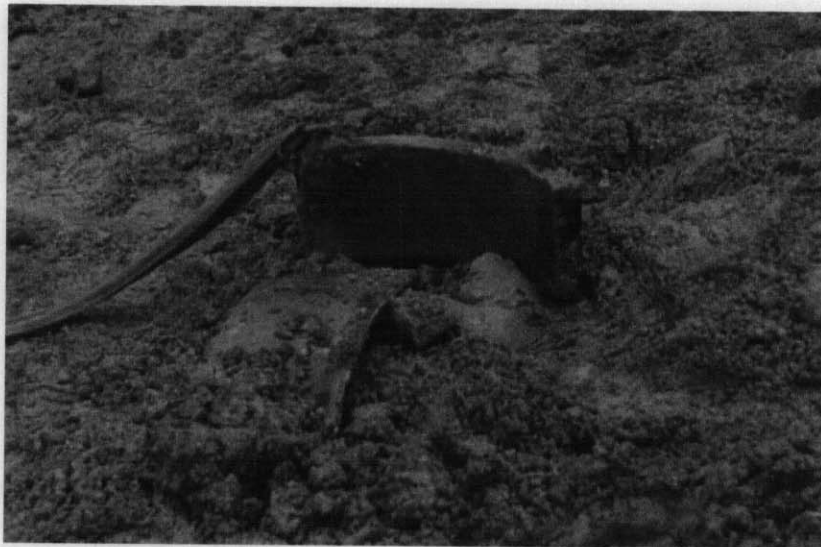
Test C2 showing that the weld was ground to improve contact.
